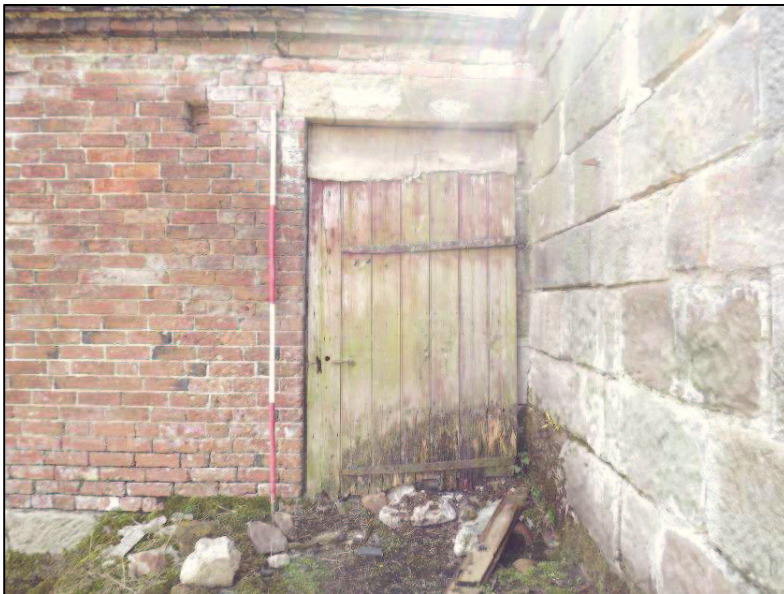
(Shot 9): Door on the northwest elevation of Barn C, looking southeast. Scale is 2m
